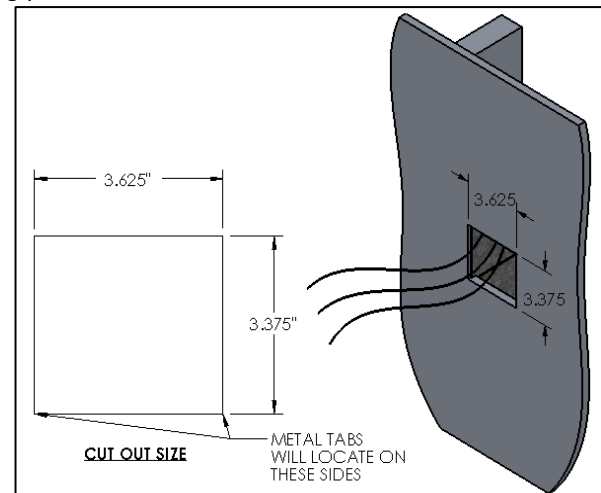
J-BOX ASSEMBLY AND WALL CUT OUT
